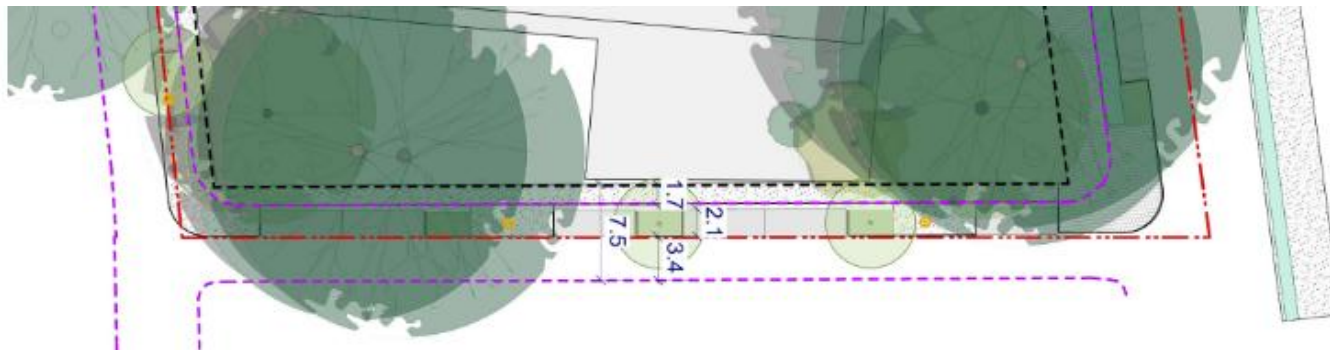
Street Plan - Gibson Street (Aspect Studios)
